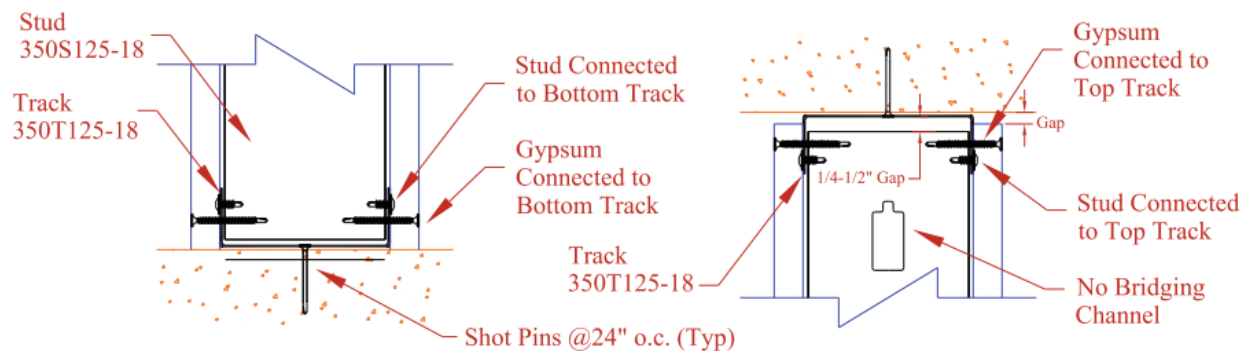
Typical framing and sheathing full connection (Davies et al., 2011)
